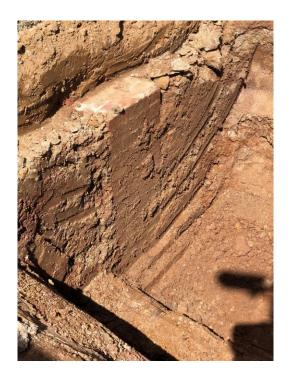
Redbrick foundations with intact step down brick formation, 2 m below carpark surface
